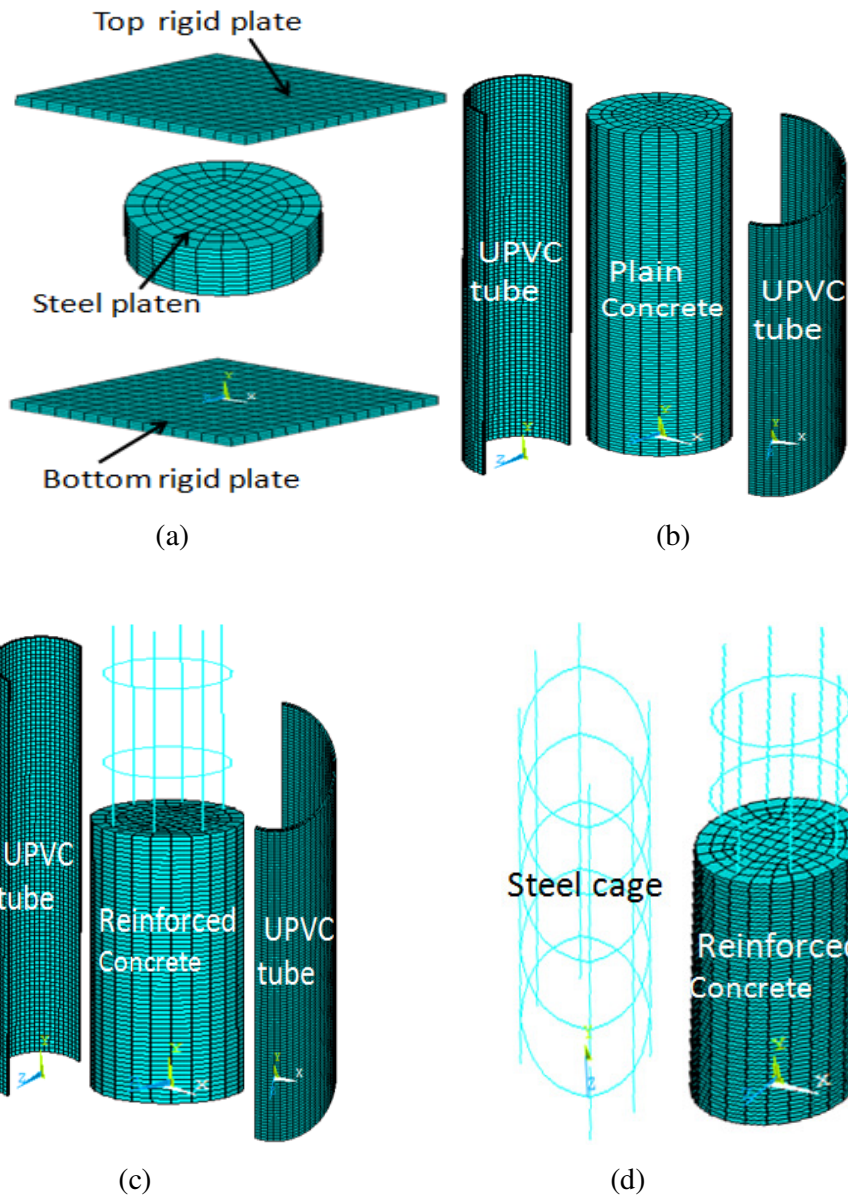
Proposed models for simulation (a) Rigid plates and steel platens (b) PCFUT specimen (c) RCFUT specimen (d) RCC specimen
